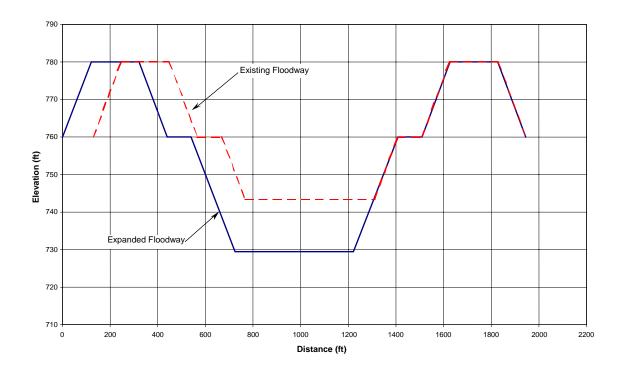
Scheme B Schematic Cross Sections (Inlet to Birds Hill)
